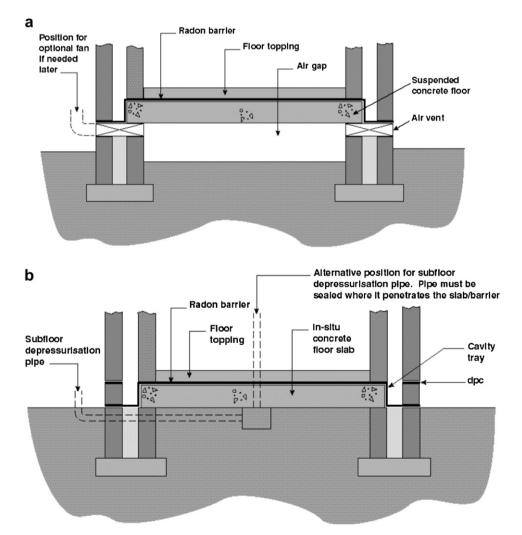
Radon protection: (a) to a suspended concrete floor; (b) to a ground bearing concrete floor slab [32].
